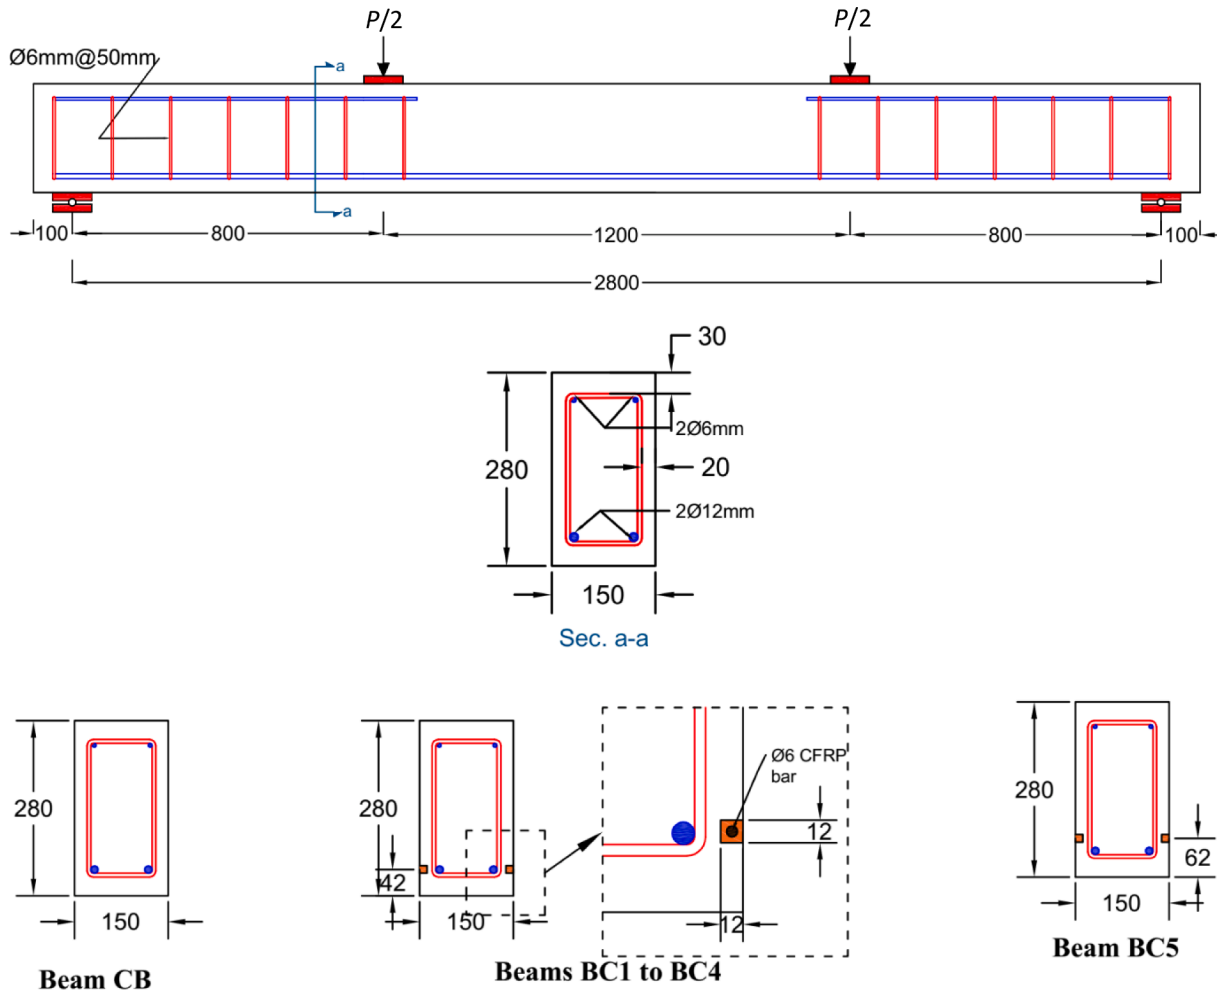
Reinforcement details and strengthening configurations, for reference beams in [27].
